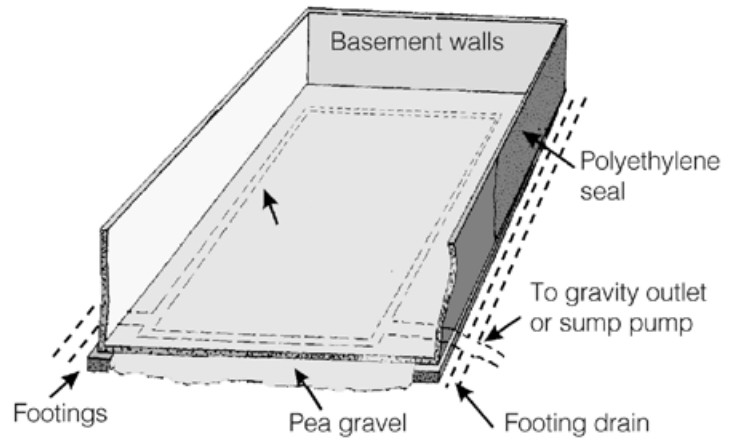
This illustration shows foundation construction that includes footing drains.
